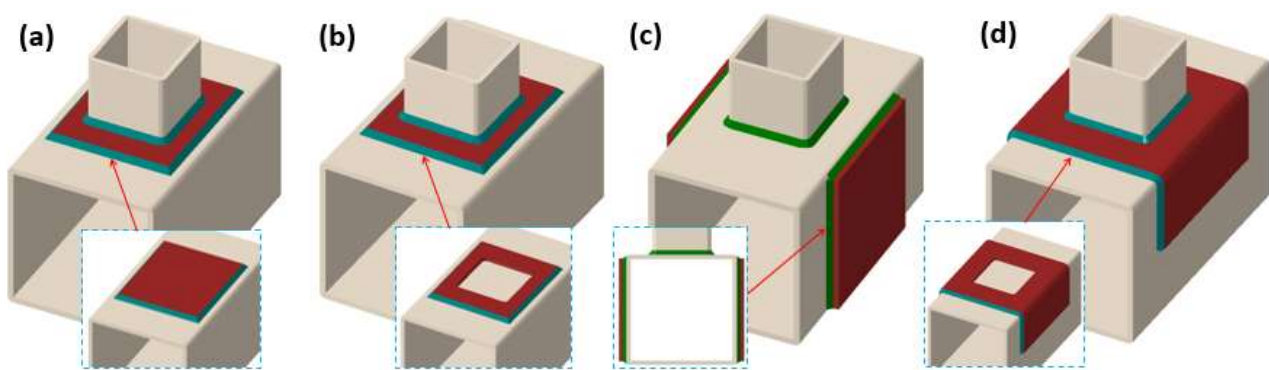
Typical chord surface welding plate reinforcement methods. (a) DPR SHS T-joint, (b) CPR SHS T-joint, (c) Sidewall plate reinforcement, (d) L-shaped CPR SHS T-joint.
